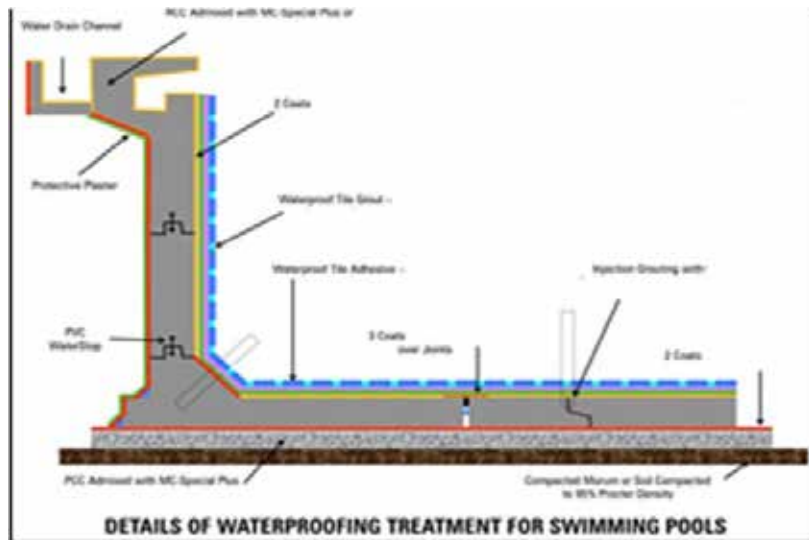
In-depth Detailing of Swimming Pool Waterproofing
